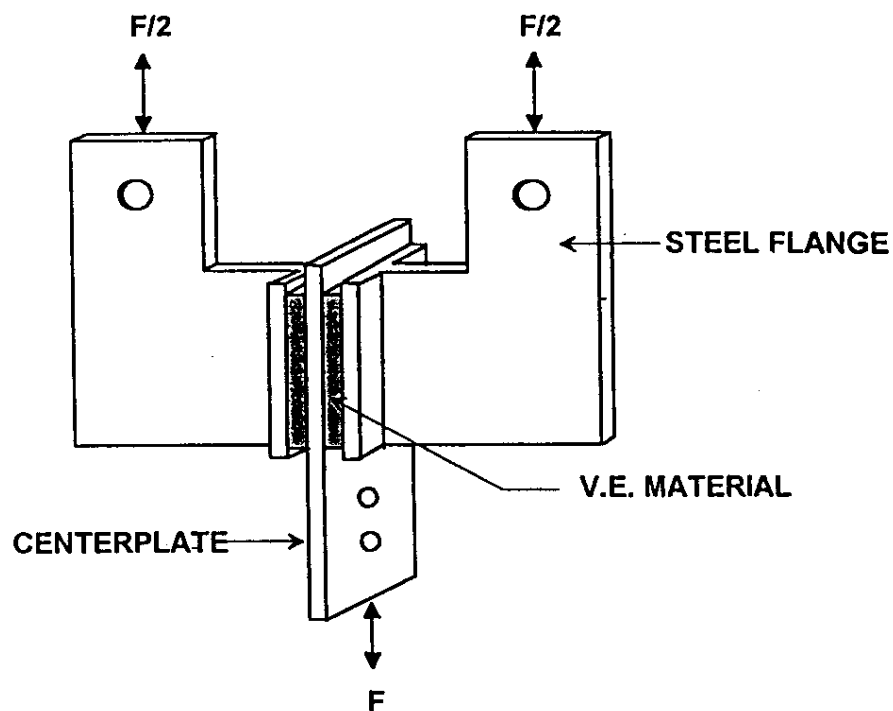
Layout of viscoelastic dampers (Chang, Lin, Lai)
